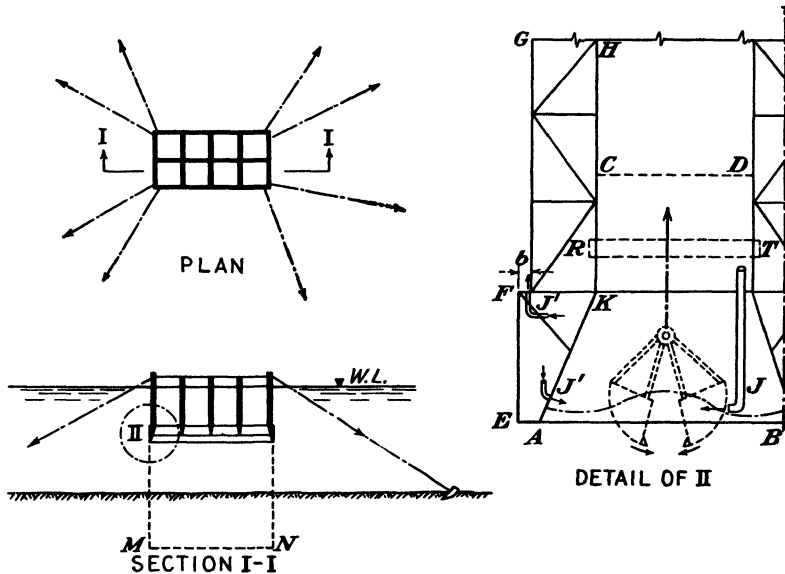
Sketch illustrating methods of flotation and excavation of open caissons for bridge piers.
